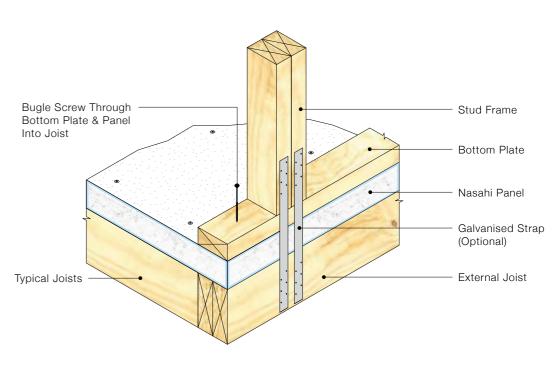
Load Bearing Wall Option 2: Back Blocking Under Loadbearing Wall
